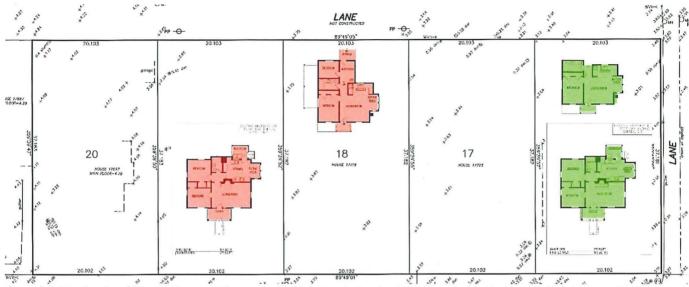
Existing location of Mooring House and Cottage in red with proposed relocation site at the end of the development block in green with the cottage plywood addition removed. This drawing is not intended to inform of the land topography. Scale of buildings and locations are approximative.
